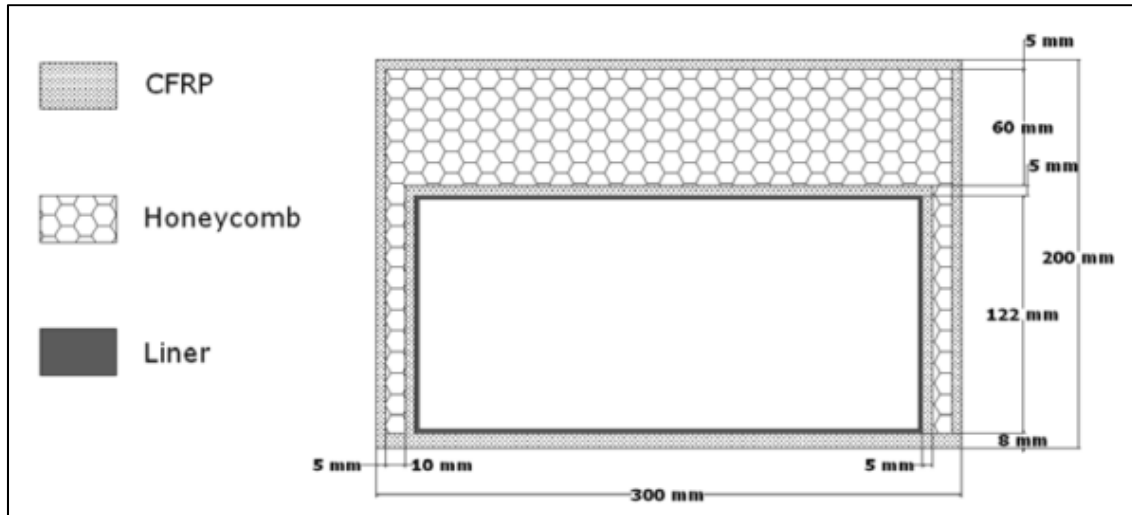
Cross section of CFRP Portable Bridge Beam (Agusril & Norazman, 2013).
